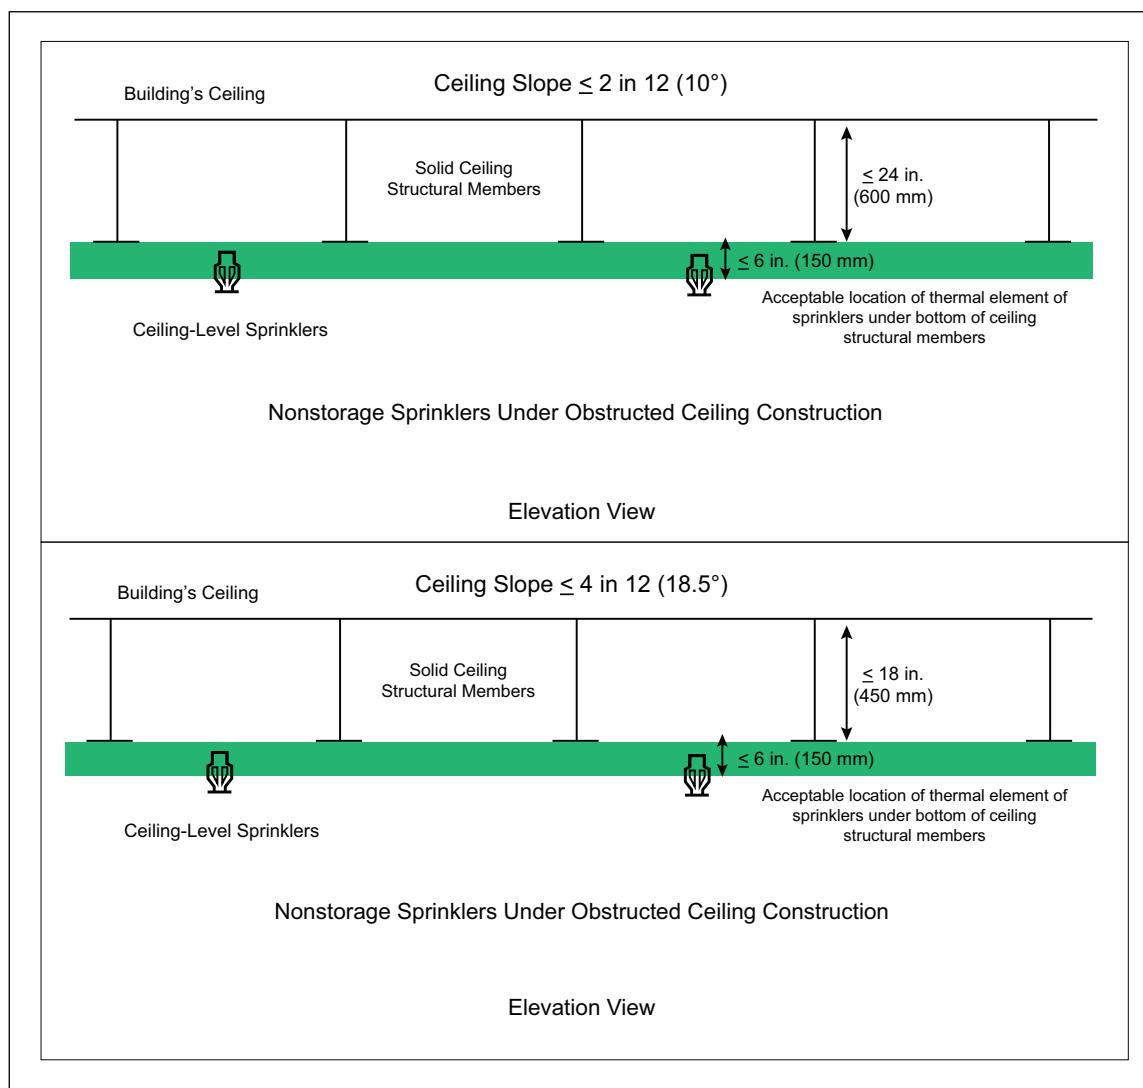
Vertical location of Nonstorage pendent and upright sprinklers under obstructed ceiling construction
